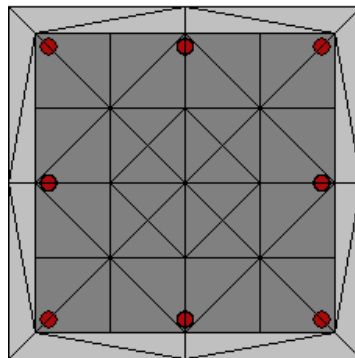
Column fiber section of Rectangular Column section 0.35x0.35 (8 No.16) for 4 story.
